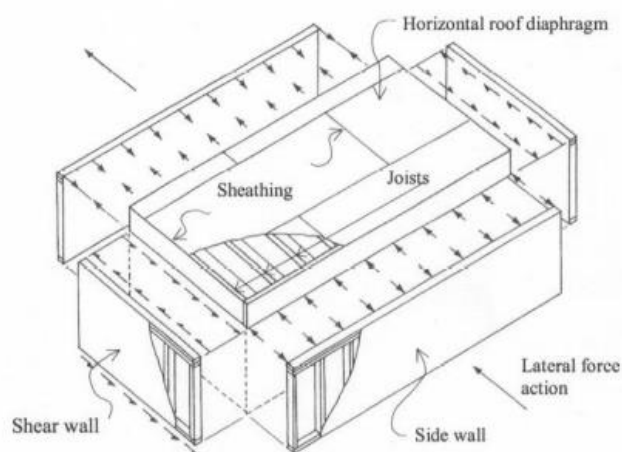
Lateral Load Carrying Mechanism of Light Framed Building, Bredel (2003)
